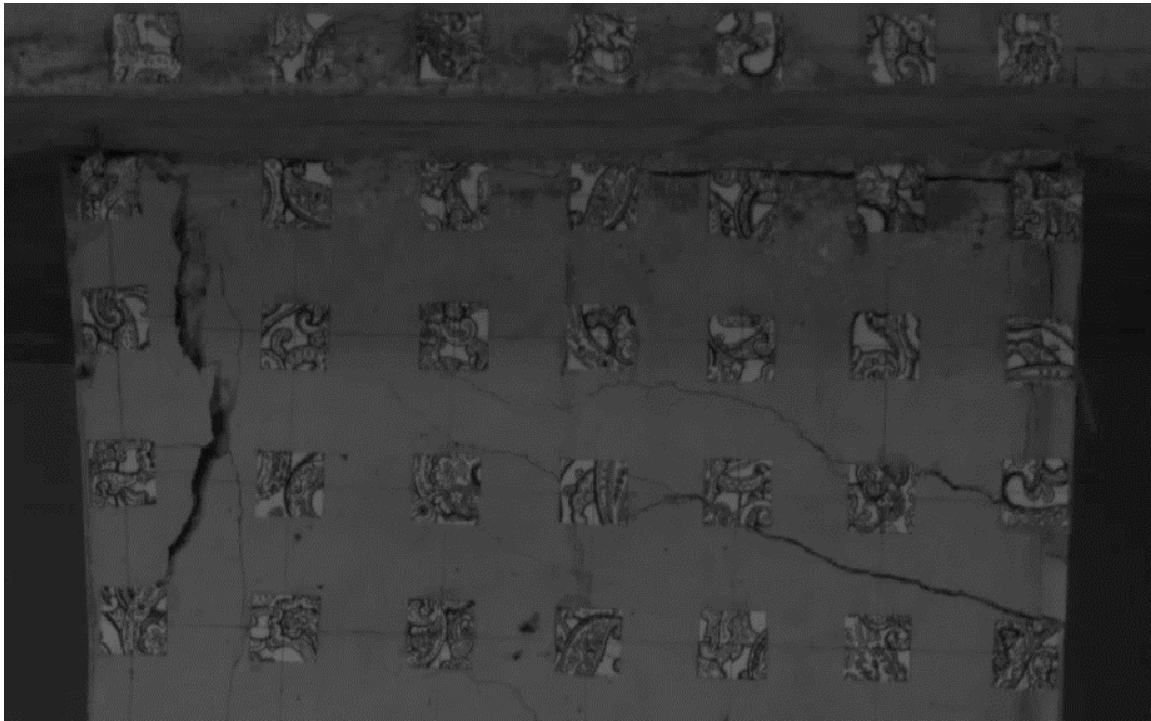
Spalling damage states 3 (SD3) for column CH100
